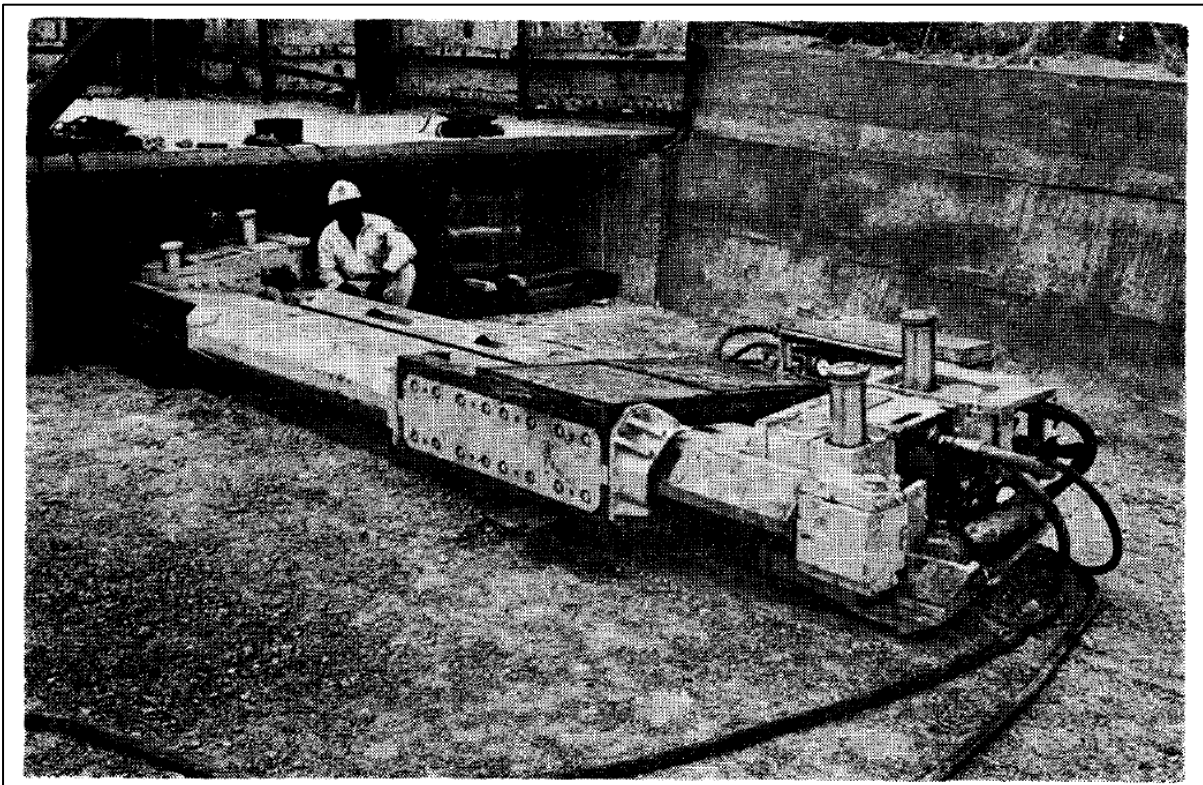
Continuous rock-cutting machine (Joughin, 1976)
